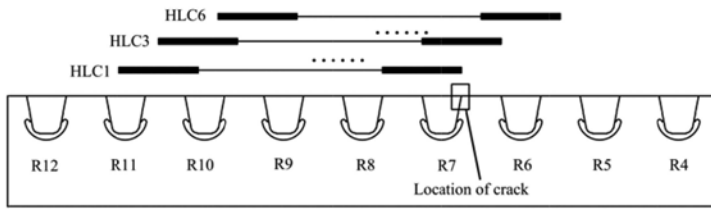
Transverse loading case of a rib-to-deck plate connection between crossbeam.
